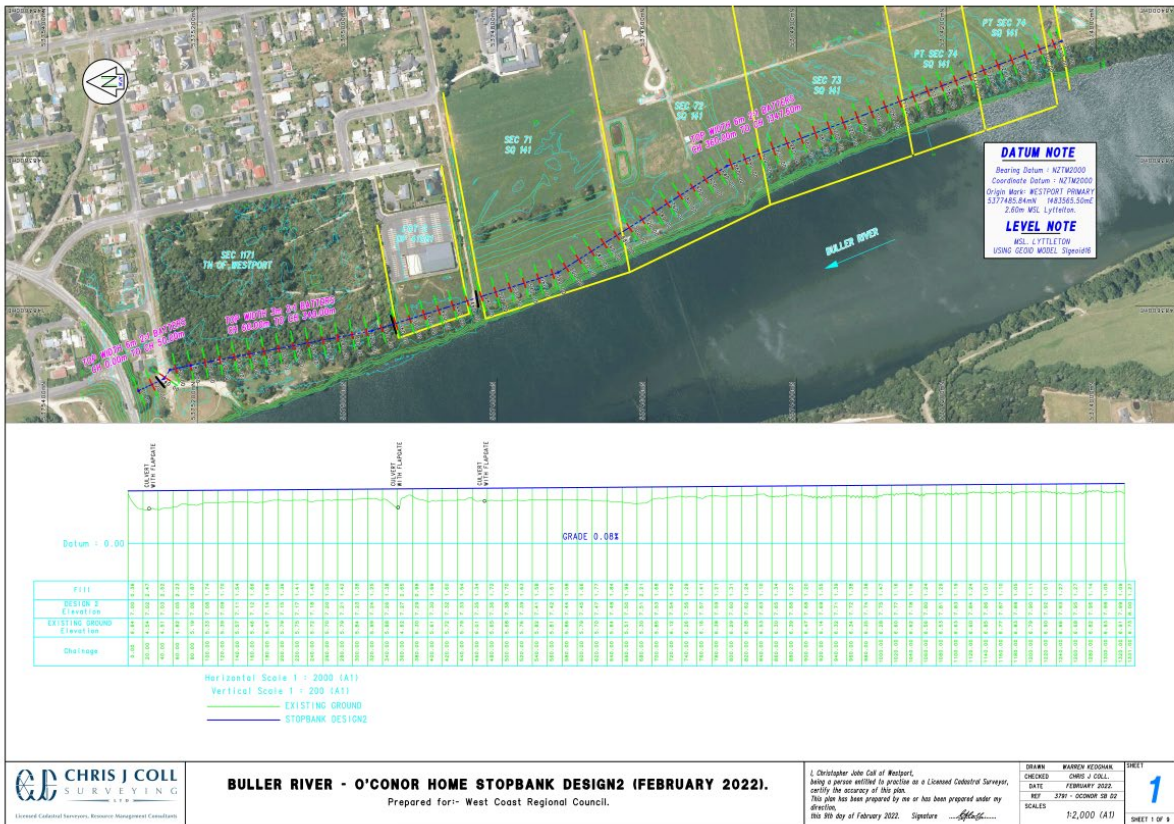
O'Conor Home Stopbank plan view and longitudinal survey
